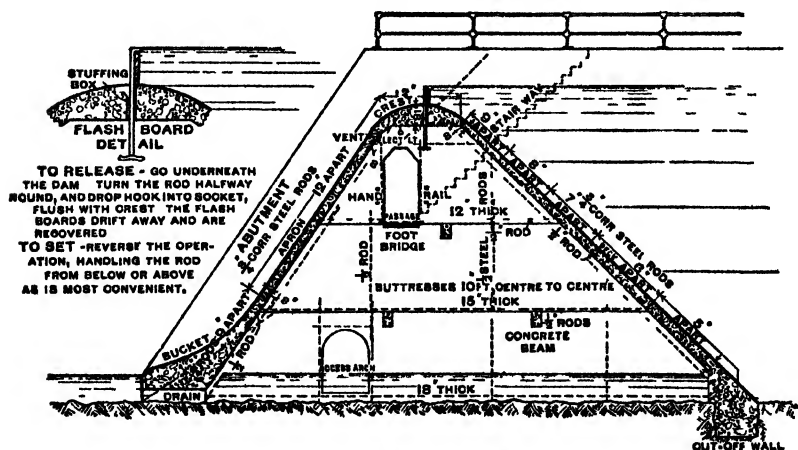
Section of Reinforced Concrete Dam at Schuylerville, N. Y. (See p. 677.)
